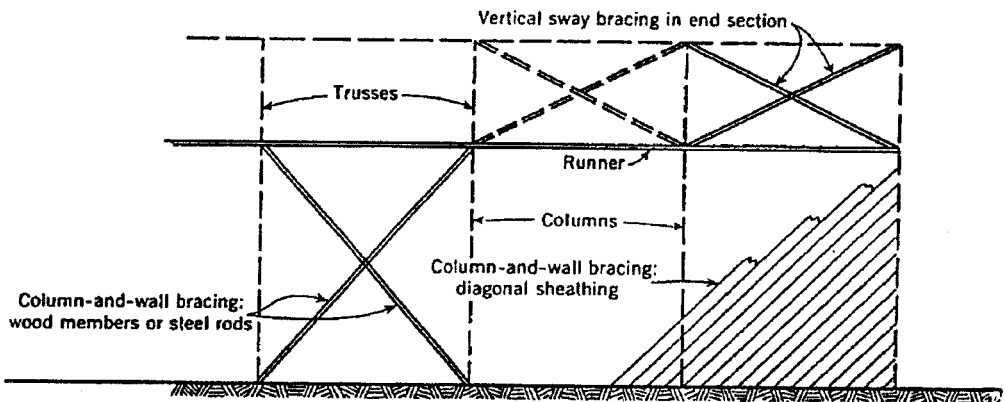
Vertical sway bracing and wall-and-column bracing
